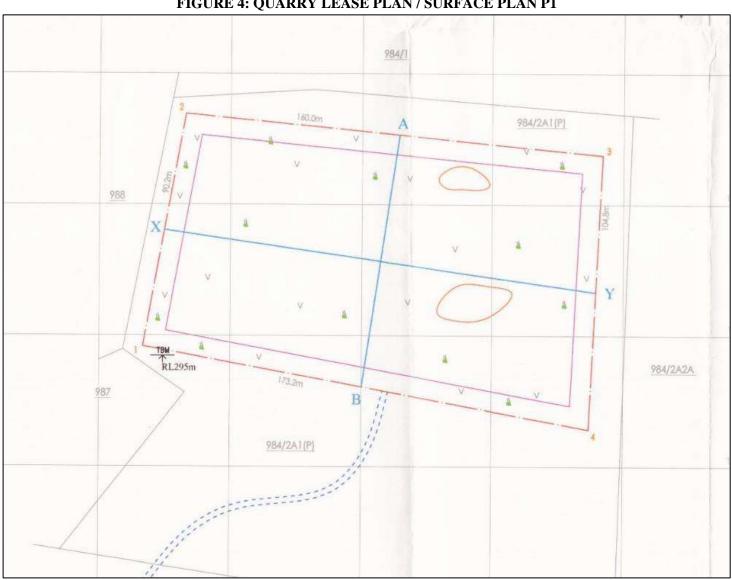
QUARRY LEASE PLAN / SURFACE PLAN P1
